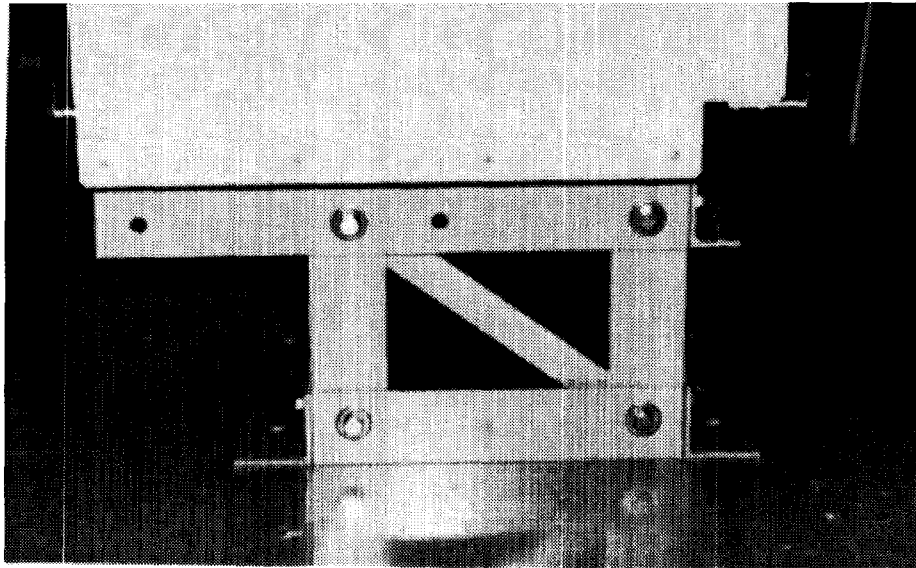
Structural pedestal for raised-floor application. Similar pedestals used in the Bay Area performed well during Loma Prieta earthquake in 1989.
